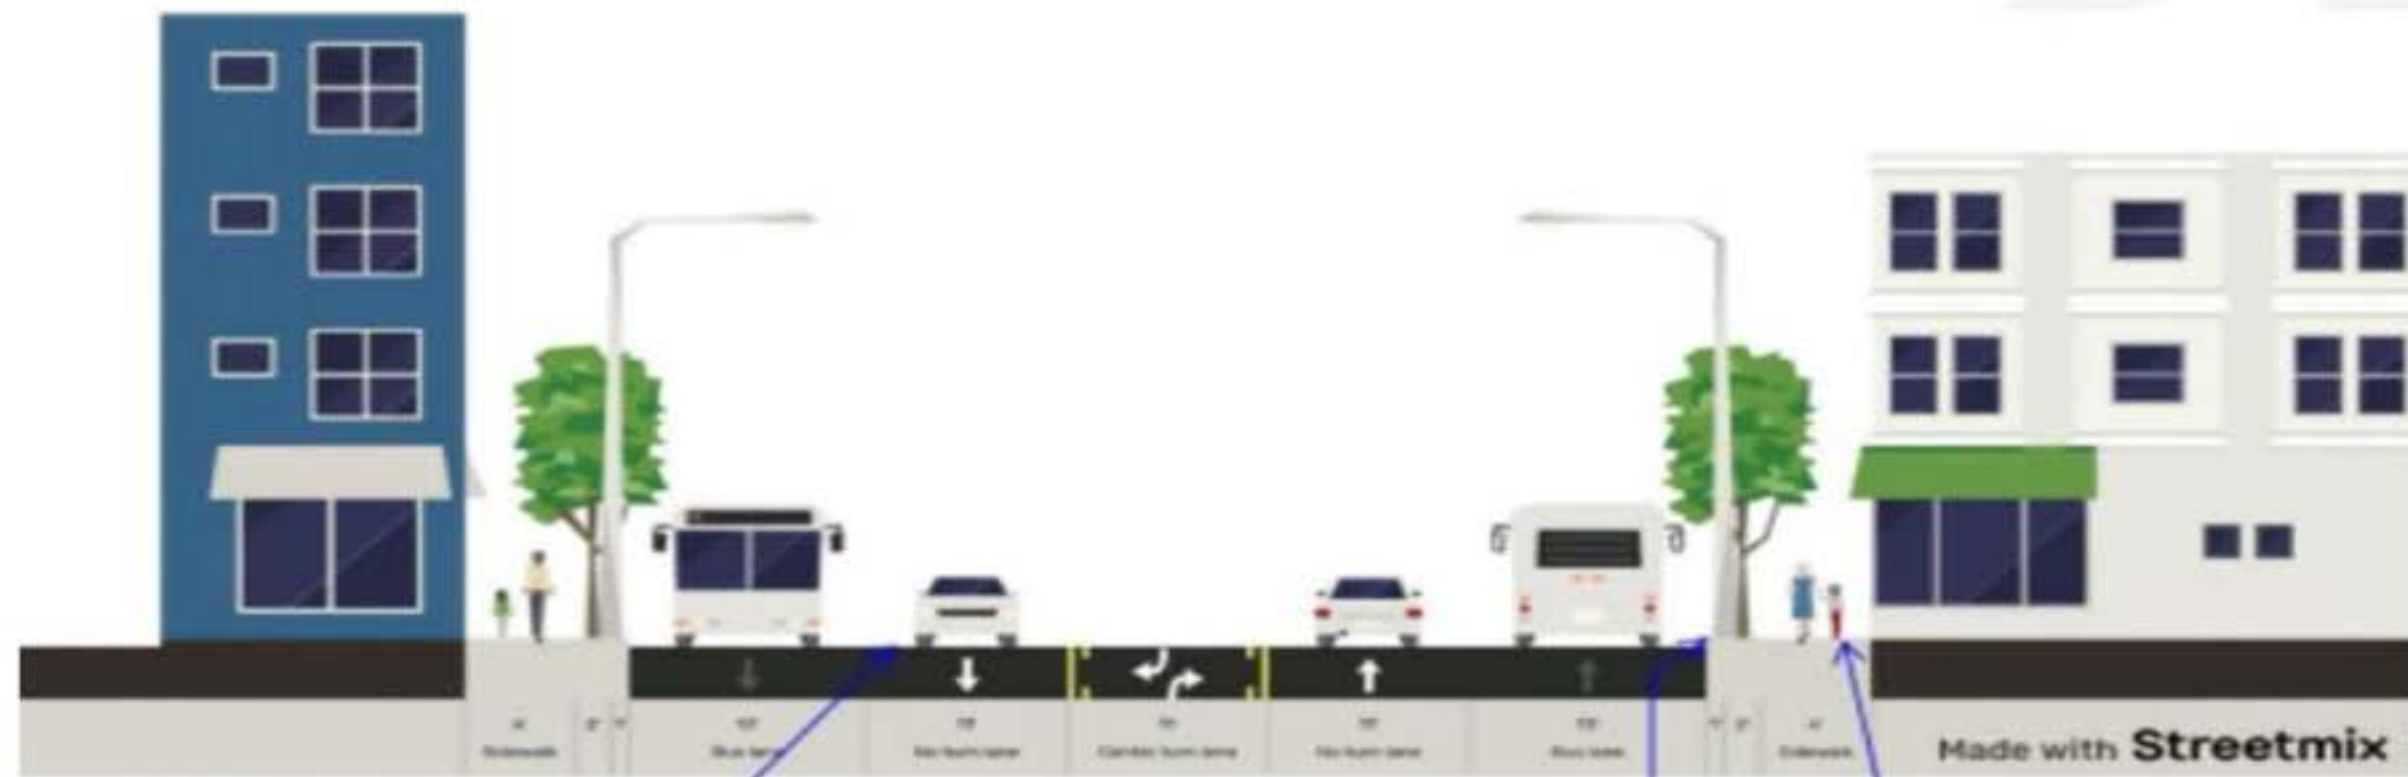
Proposed BAT Lane Cross Section at Douglas Street
